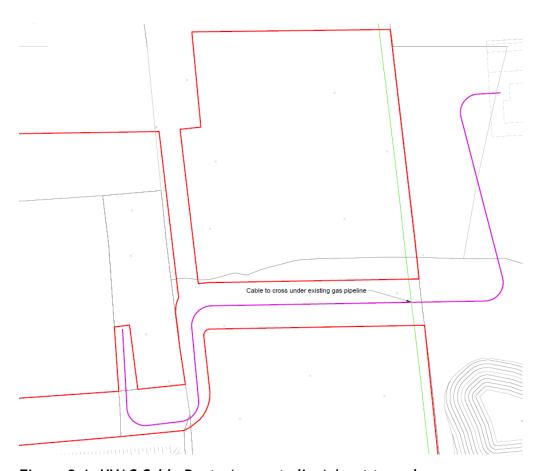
HVAC Cable Route (magenta line) | not to scale
